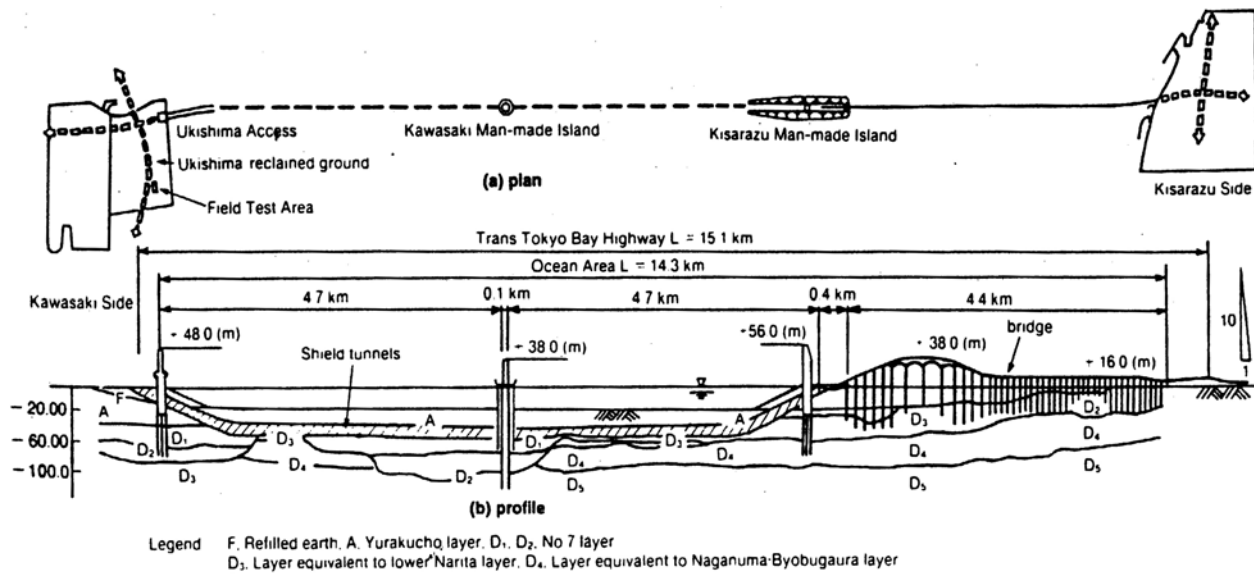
General plan of the Trans Tokyo Highway (after Wasa et al. 1991)
